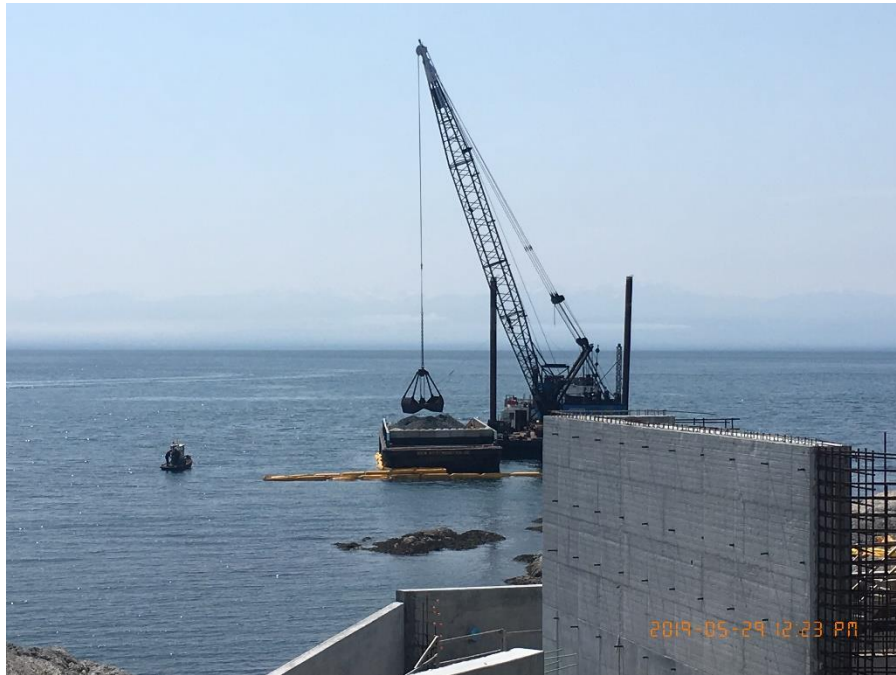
Mcloughlin Point Wastewater Treatment Plant – placing gravel mattress for marine outfall pipe.
